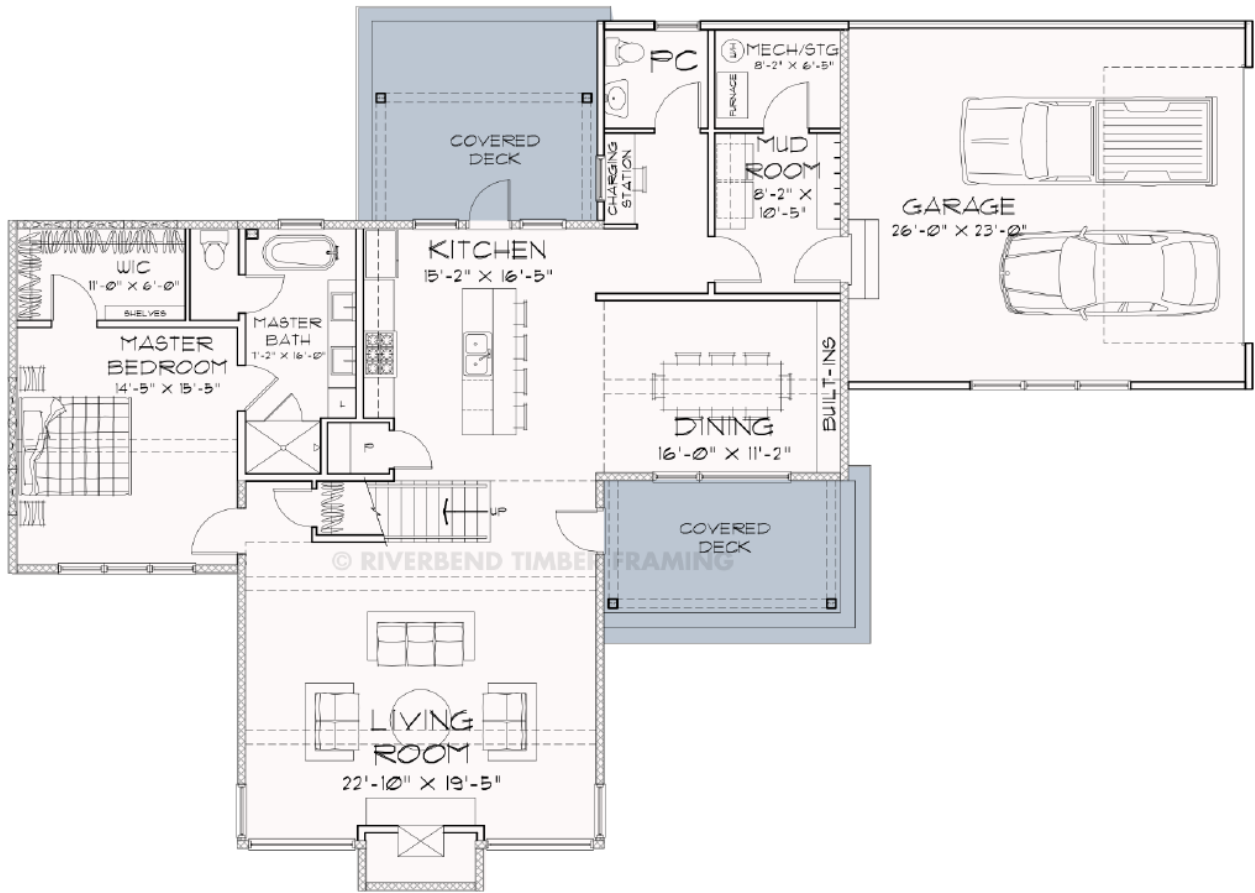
Ground Floorplan for Dwelling on Severed Lot (Source: Brauer Homes)
